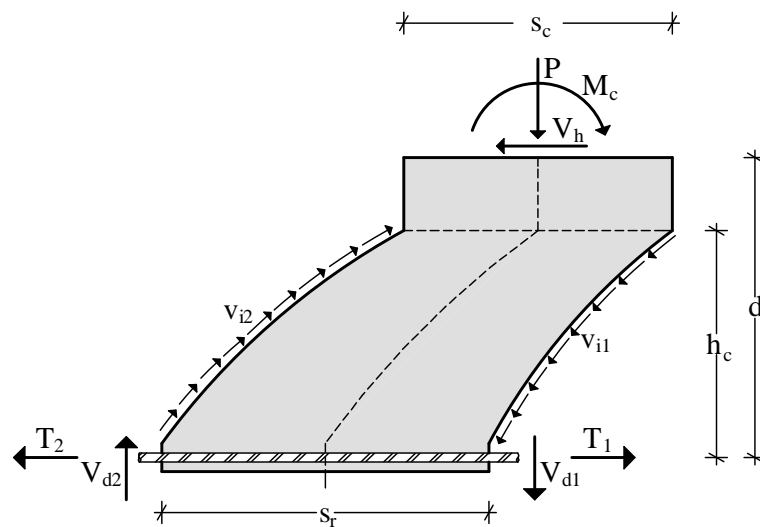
Concrete cantilever: equilibrium of the single element [3]
